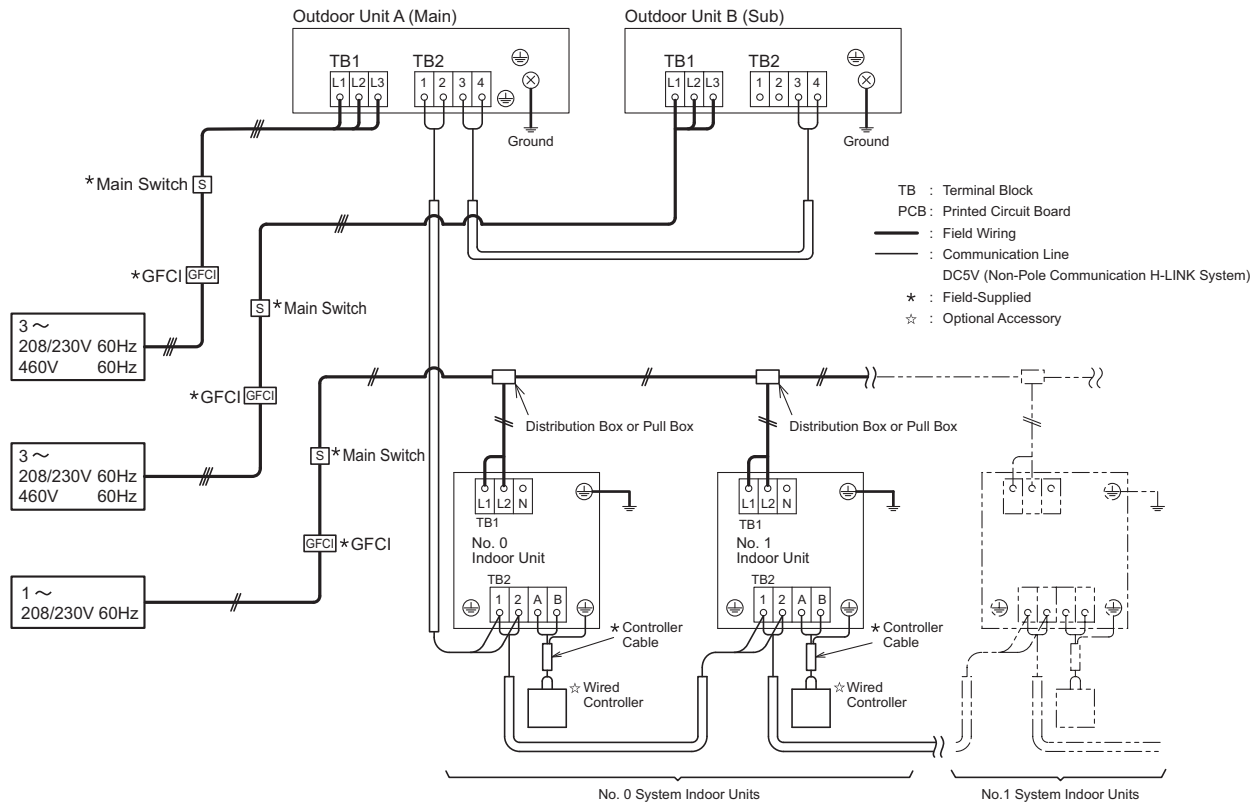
Instruction for Electrical Wiring Connection (Heat Pump System)
